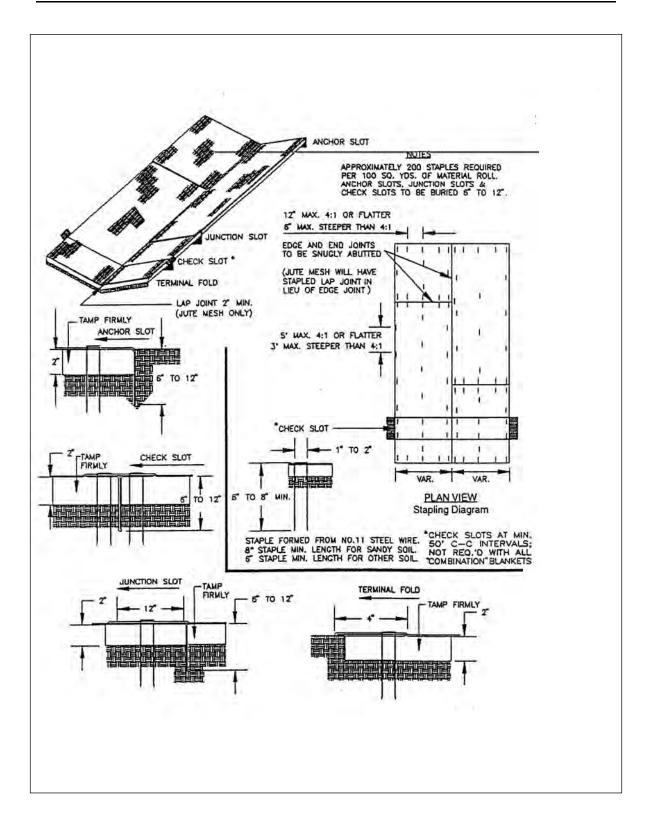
Typical Treatment 1 – Soil Stabilization Blanket Installation Guide
